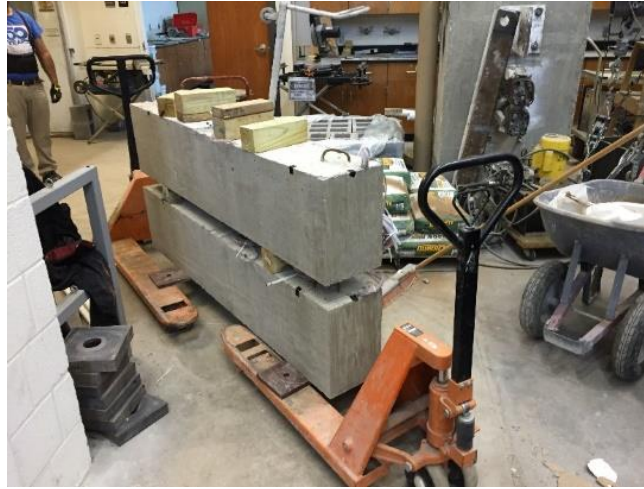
Typical photo of transportation of large-scale beams with two pallet jacks to the curing room
